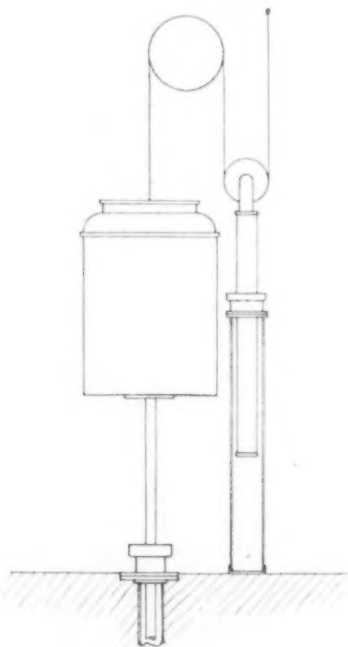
ELEVATOR PROPOSED FOR METROPOLITAN TOWER
